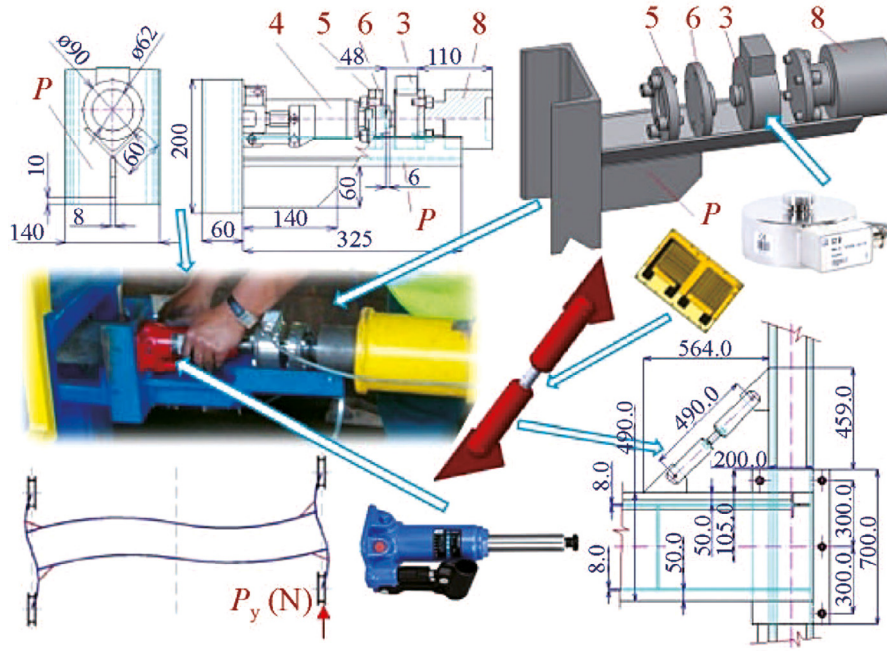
Platform  $P$  supporting the array of machine parts used exerting and detecting compressing force  $P_{yc}$ .
